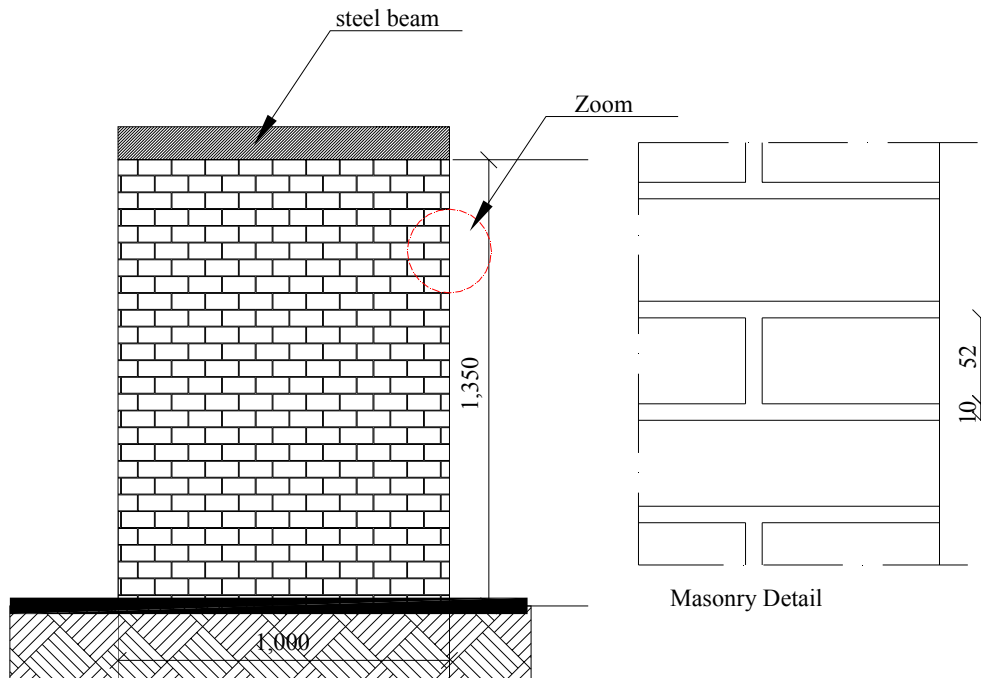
Unreinforced masonry shear walls: low wall (LW)
